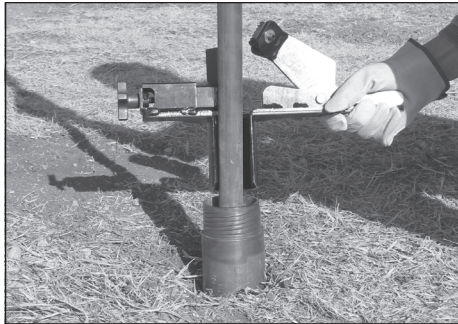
The side of the rod holder is slotted to provide easy installation over the inner rod string.
